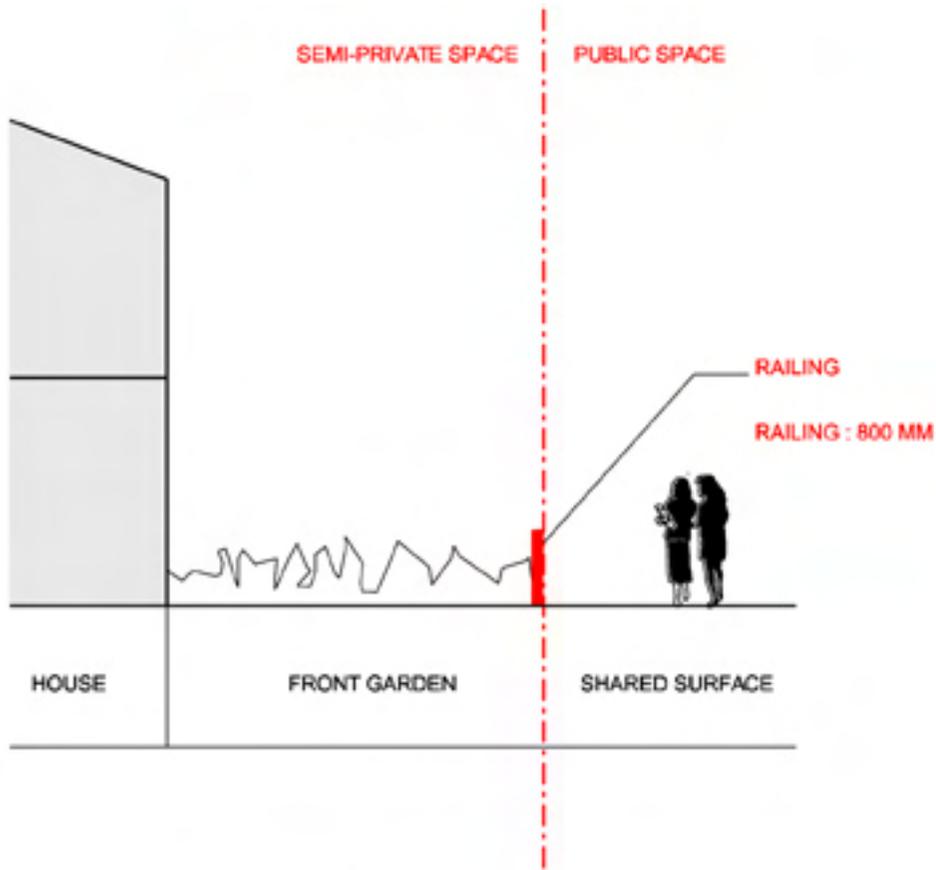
Typical arrangement of front boundaries, scale 1:100
